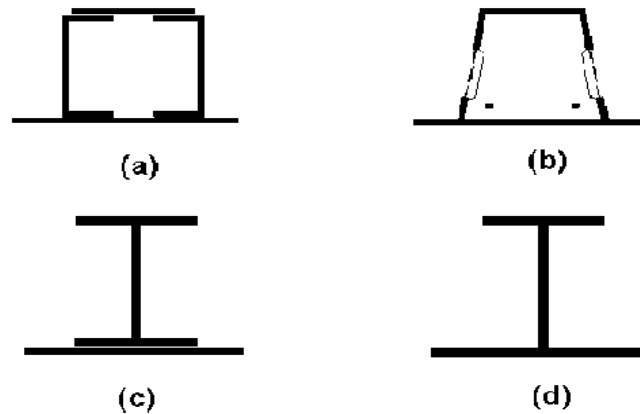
Different Types of Slim Floor Beams: (a) Thor-Beam; (b) Delta-Beam; (c) Slimflor Beam; (d) Asymmetric Slim Floor Beam.
